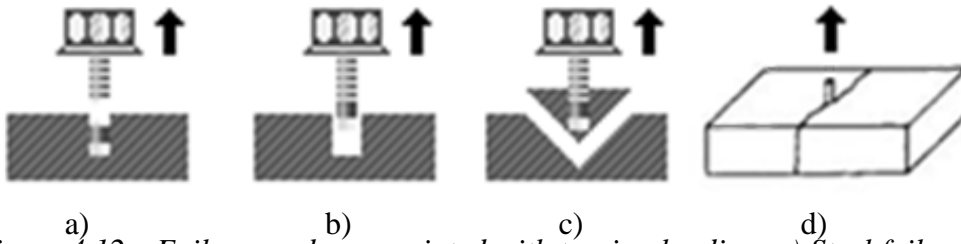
Failure modes associated with tension loading. a) Steel failure. b) Pull-out failure. c) Concrete cone failure d) Splitting failure. (HILTI, 2009)
